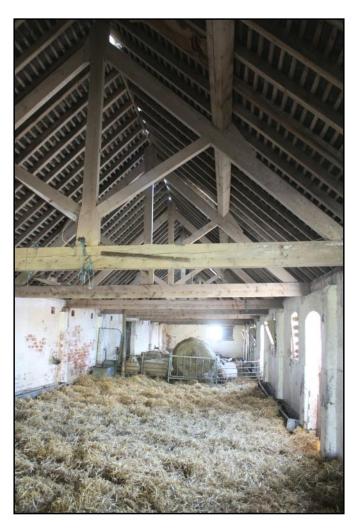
Internal view of the open 9-bay south range showing roof structure and lighting from west (right).
